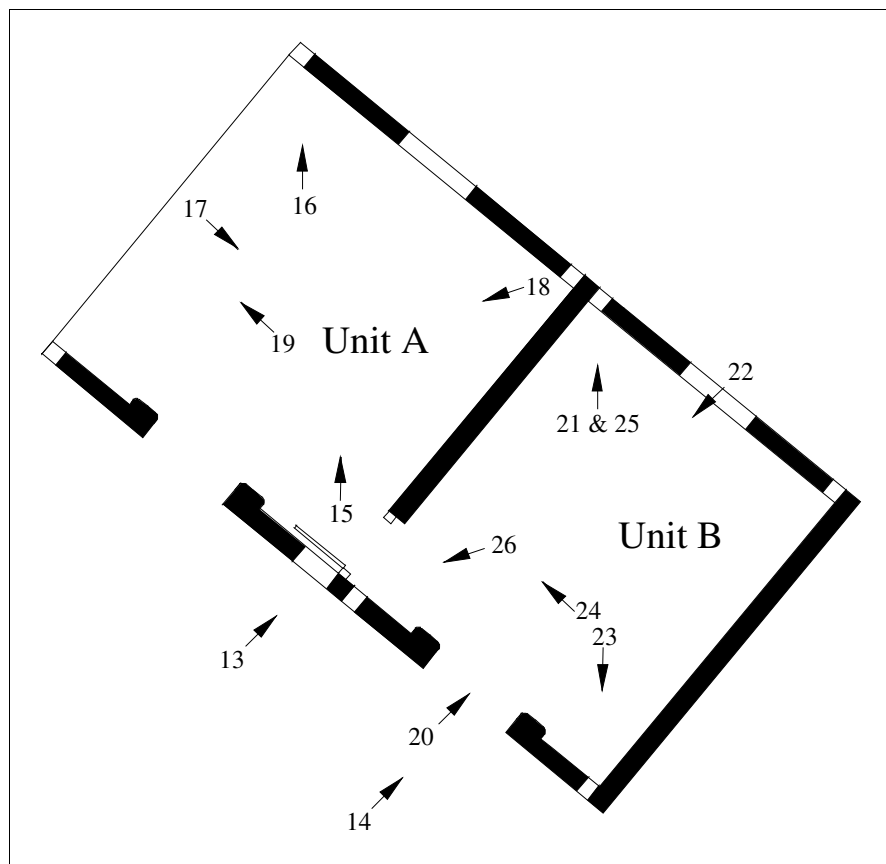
Plan of Building 2 showing directions of photographs 13 - 26
